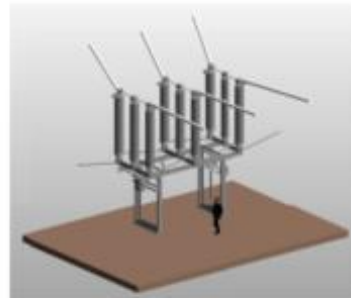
Substation Electrical Equipment (Source – (Construction Plans Document 2.16 DCO_CO/PS/6_01) [APP-065])
